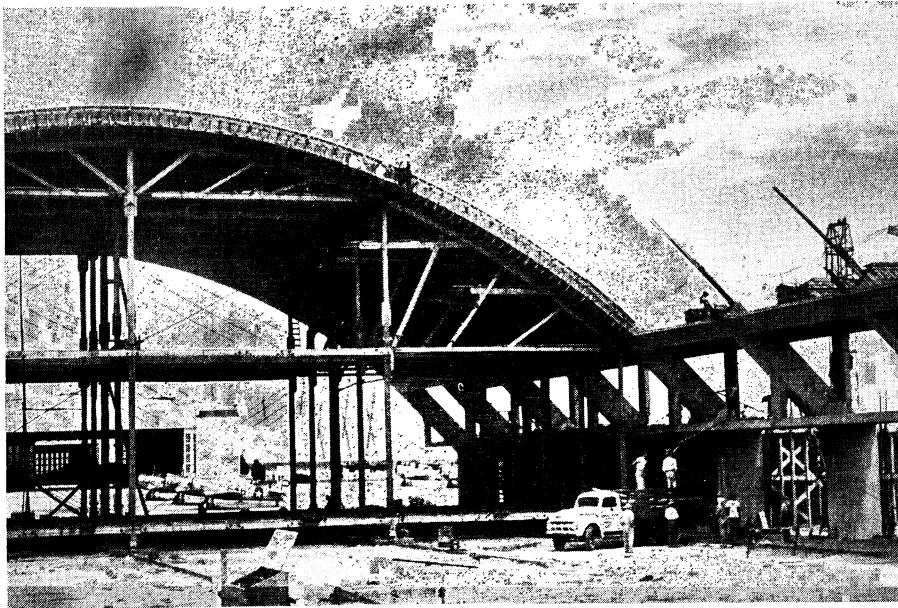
Hangar for U. S. Navy. Centering consisted of 10-in. posts and  $\frac{3}{4}$ -in. round steel diagonals supporting wood trusses with glued laminated chords. Truss web members utilize wood for compression and steel rods for tension. Horizontal struts are of built-up channel section with 2 x 10-in. side pieces and a 2 x 14-in. piece on top and with spacer blocks as required for stiffness
